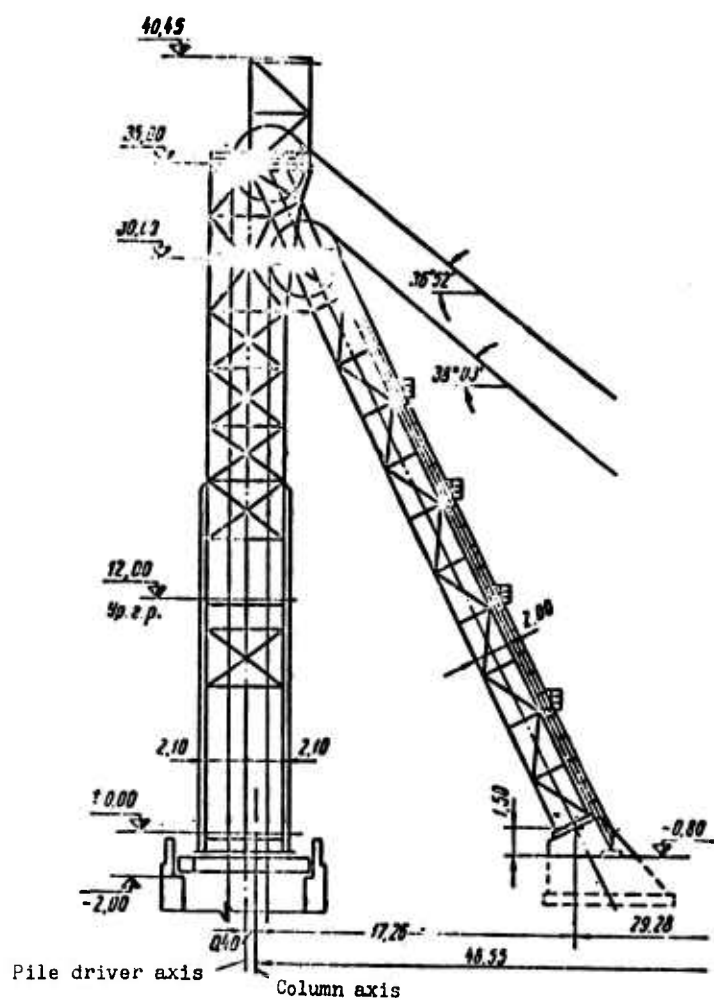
Diagonal pile driver with trusses in the main and transverse planes.
